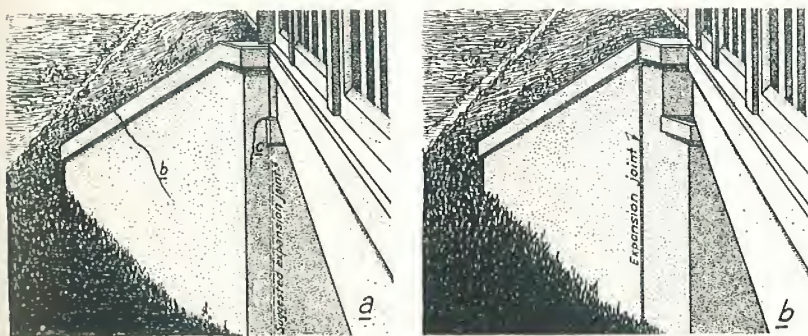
Cracks *b* and *c* in abutment with monolithic wingwalls (type *a*) may be avoided if the wingwalls are separated from the breastwall by expansion joints. Two types of joint layout are indicated.
